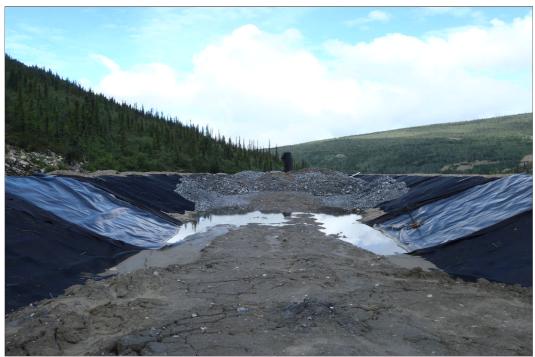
PAG Waste Storage Facility perimeter berm (Facing northwest – July 28, 2011)
